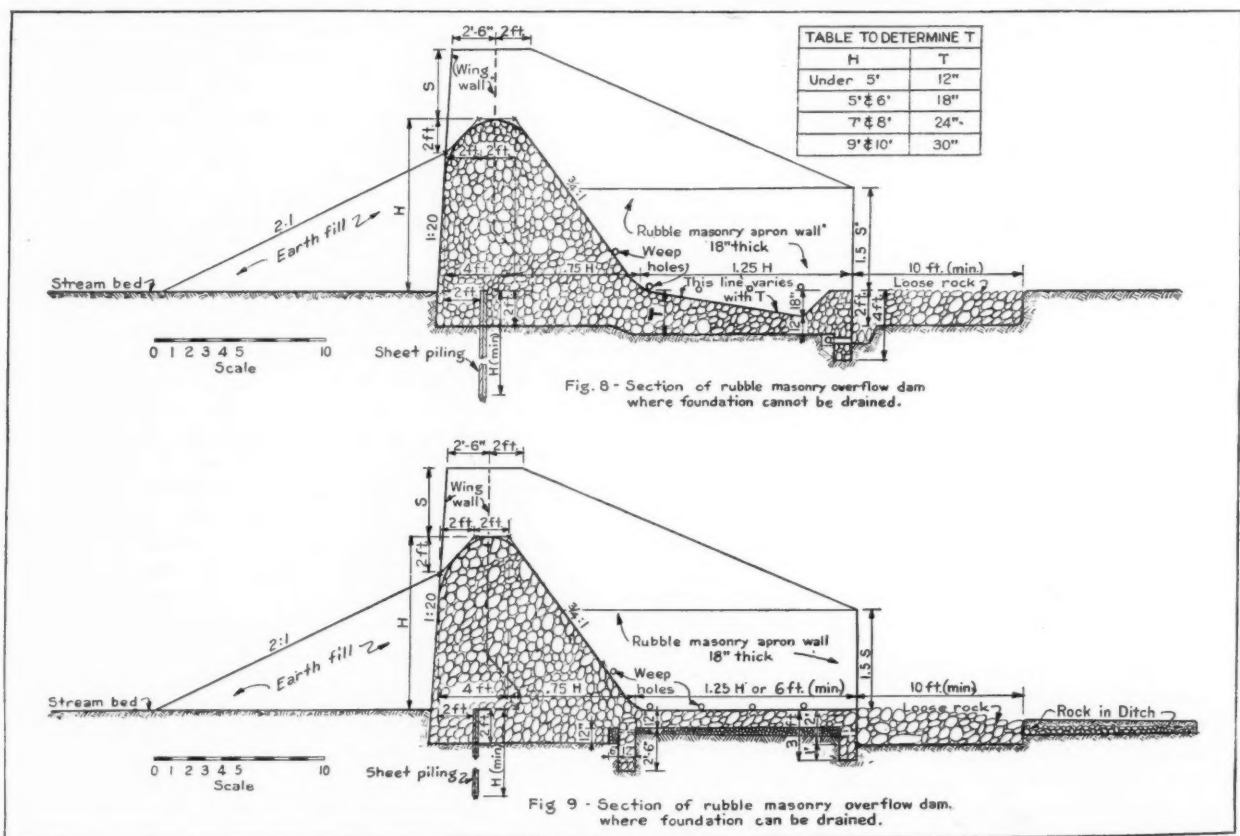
Section of rubble masonry overflow dam where foundation can not be drained. Fig. 9—Section of such dam where foundation can be drained
